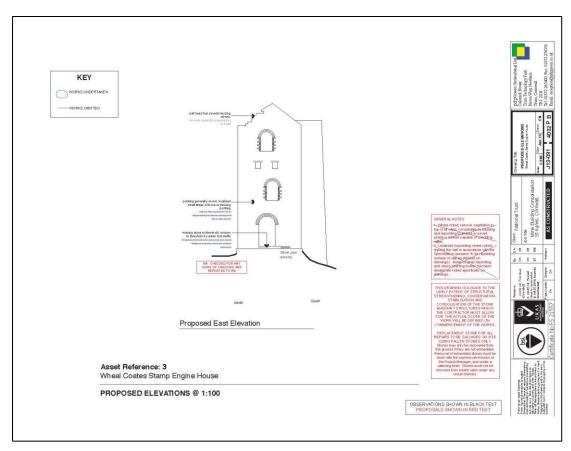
Eastern external elevation of Wheal Coates stamps engine house.
